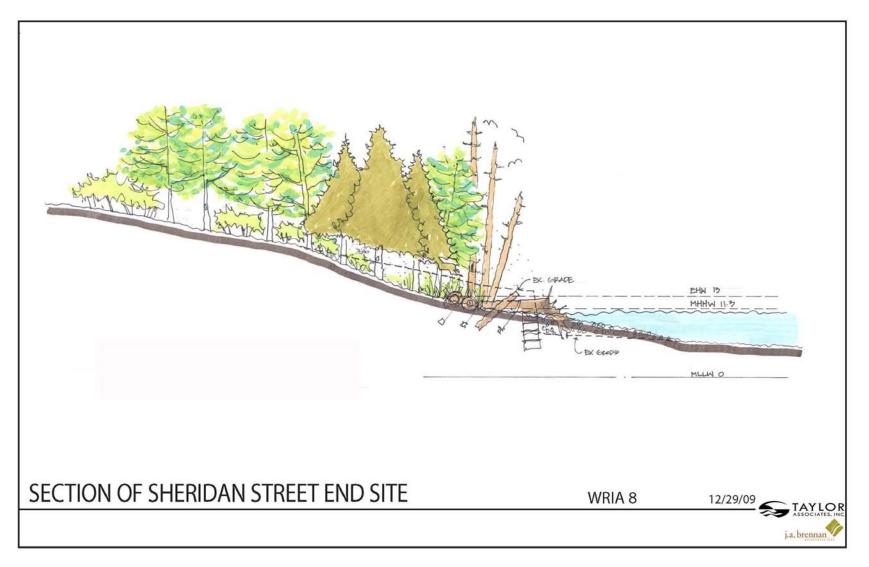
Cross sectional view of West Sheridan Street End restoration site.
